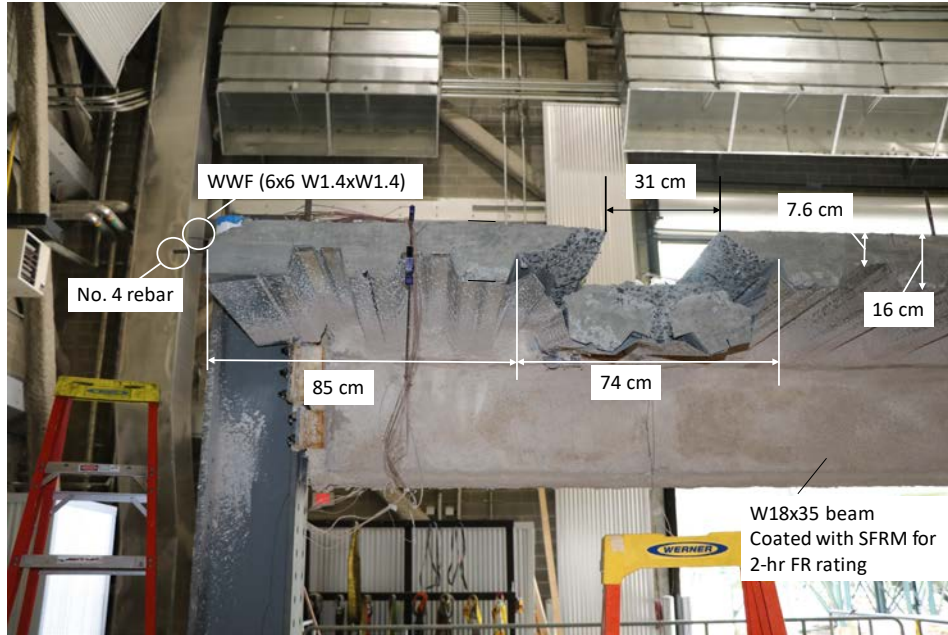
Front view of damaged concrete slab of CB-SP-SC.
